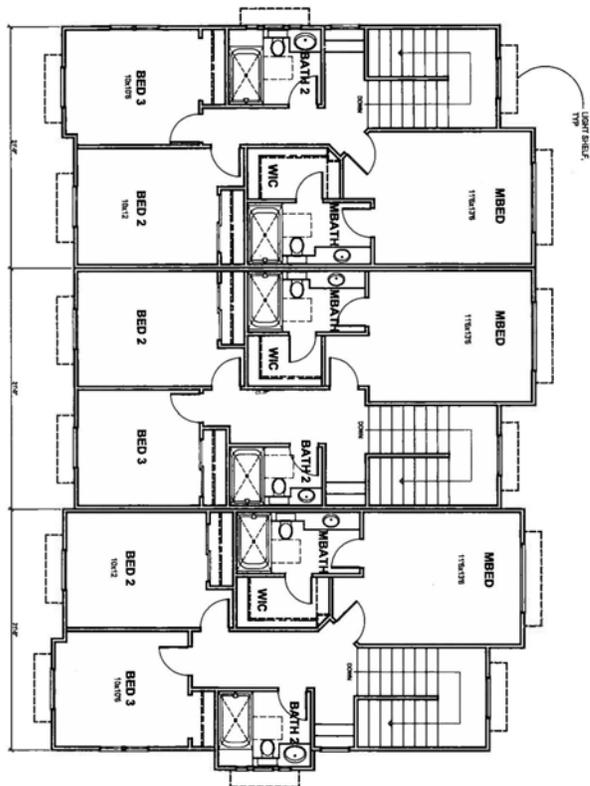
Exhibit BBB: South Block: Rowhouses (Lots 11-45) Upper Floor Plan
